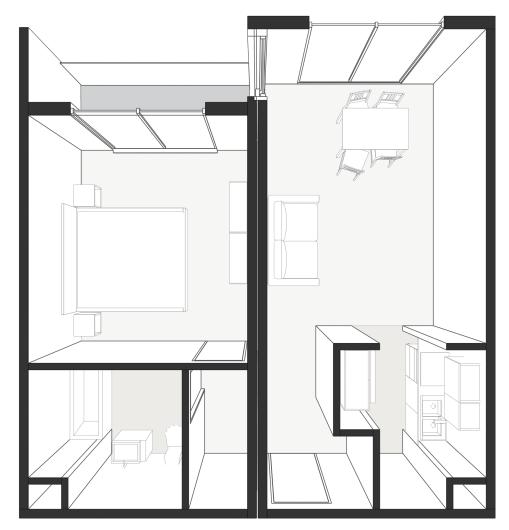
1-Bedroom apartment\_Perspective view / out of scale
